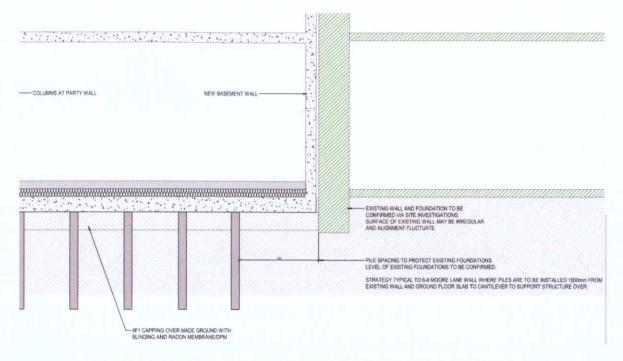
Example of Foundation Adjacent to Retained Structure.
